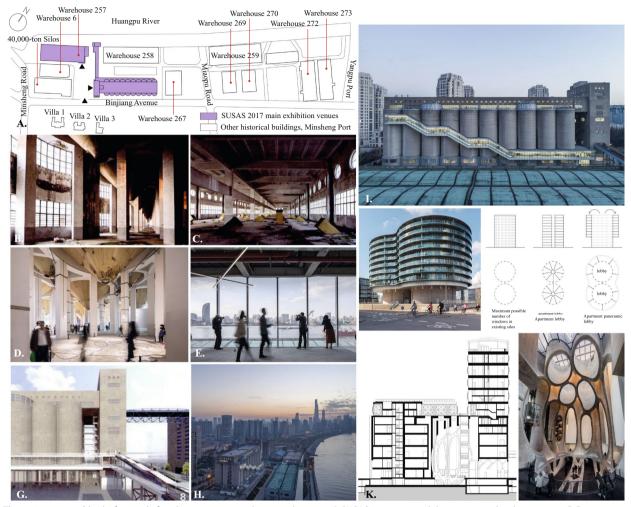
80,000-ton Silos before and after the restoration and two similar cases. A SUSAS 2017 main exhibition venue distribution map. B First floor of the soil before renovation. C Building built on silos before renovation. D First floor of the silos as the main exhibition venue. E View of the Huangpu River from the interior of the aerial corridor. G Long-term renovation plan of the 80,000-ton Silos. H The Silos are located in the East Bund of the Huangpu River. I North elevation of the silos after the first phase of renovation. J Transforming the silos into apartments: Frøsilo in Copenhagen, Denmark. K Transforming the silos into a museum: Zeitz MOCAA in Cape Town, South Africa. (Source: J and K from https://www.google.com/imghp?hl=zh-CN. Accessed 23 September 2023; others from Ma 2018.)
